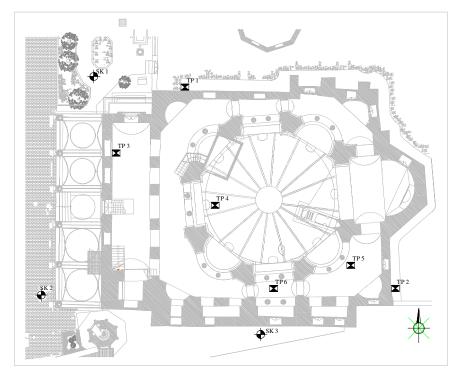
Locations of boreholes and test pits around and inside of the building (plan)
